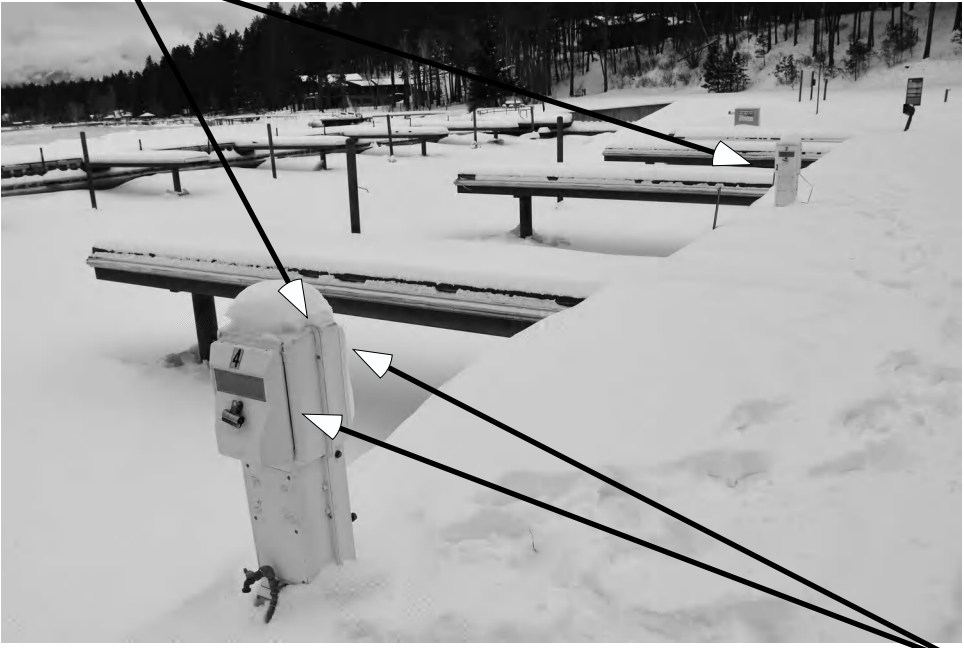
EXISTING BOAT DOCK PEDESTALS
